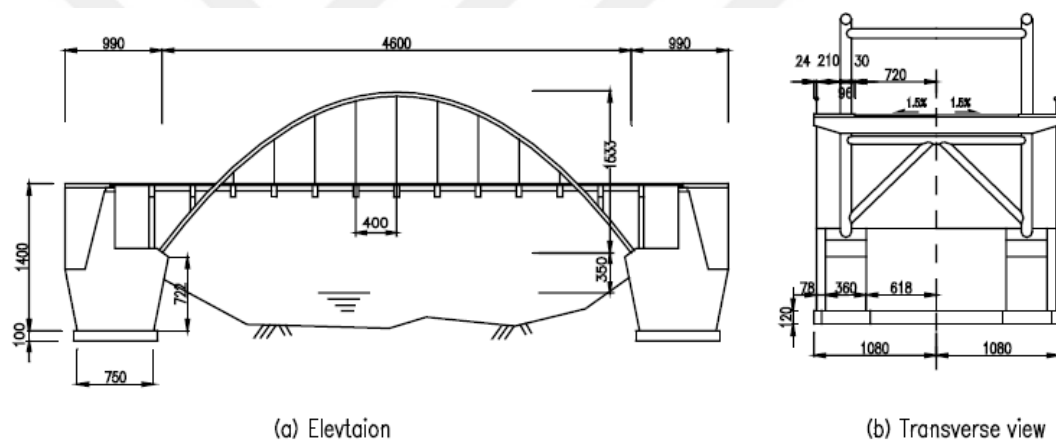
Elevation of Qunyi Bridge (unit: cm) [109]
